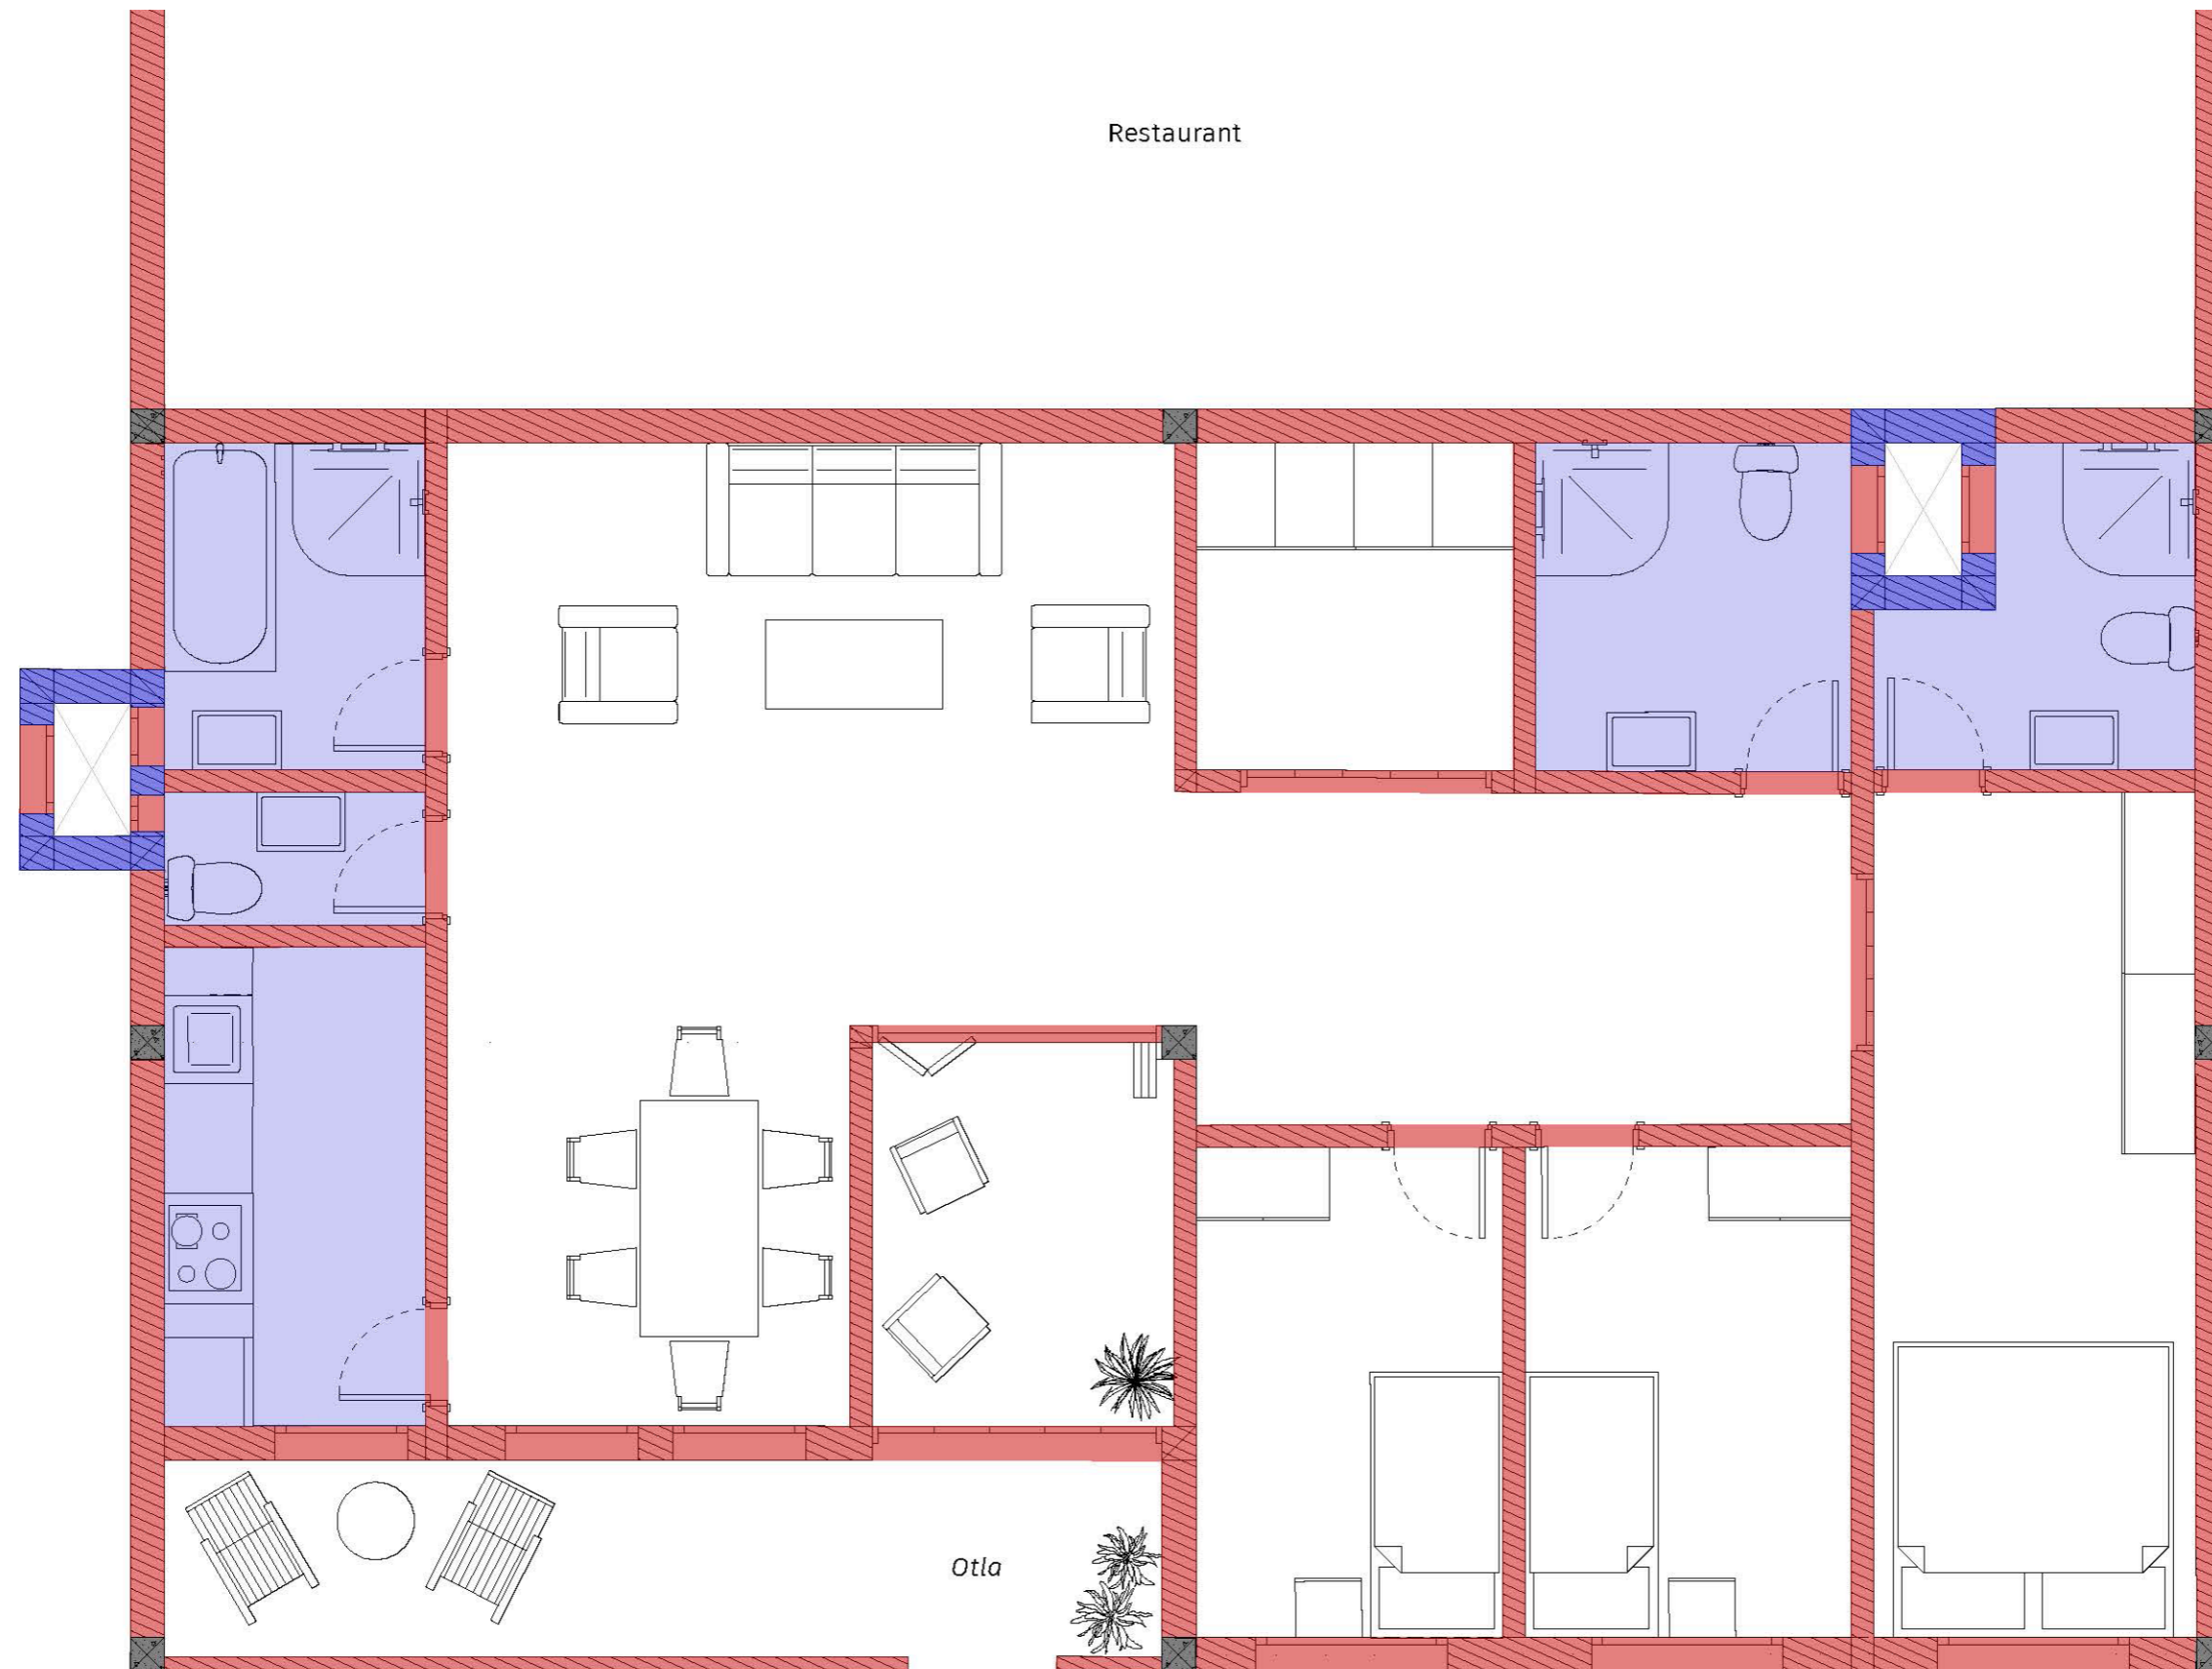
, Groundfloor of a type B apartment (author's work, 2026)
